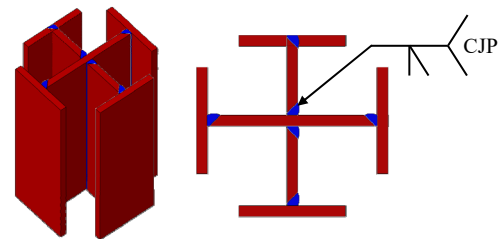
Configuration and welding details of proposed cruciform diaphragm
